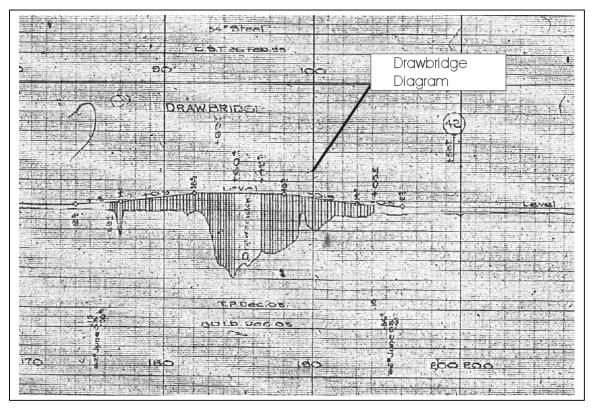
Southern Pacific Railroad Alignment showing bridge location, Santa Rosa Branch, 1887.
